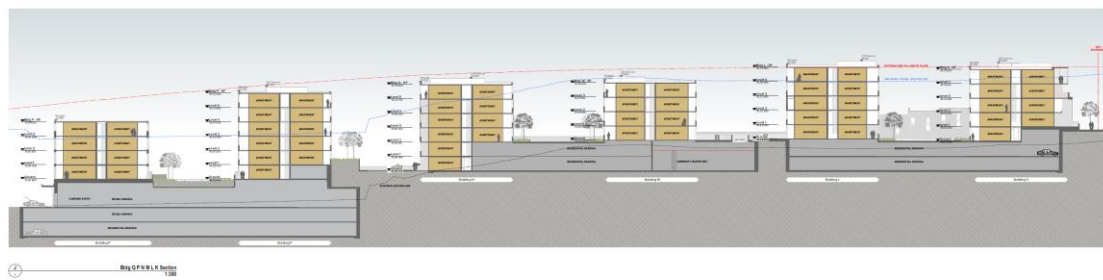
Section through Buildings Q,P N L K, fronting O'Connell Street
